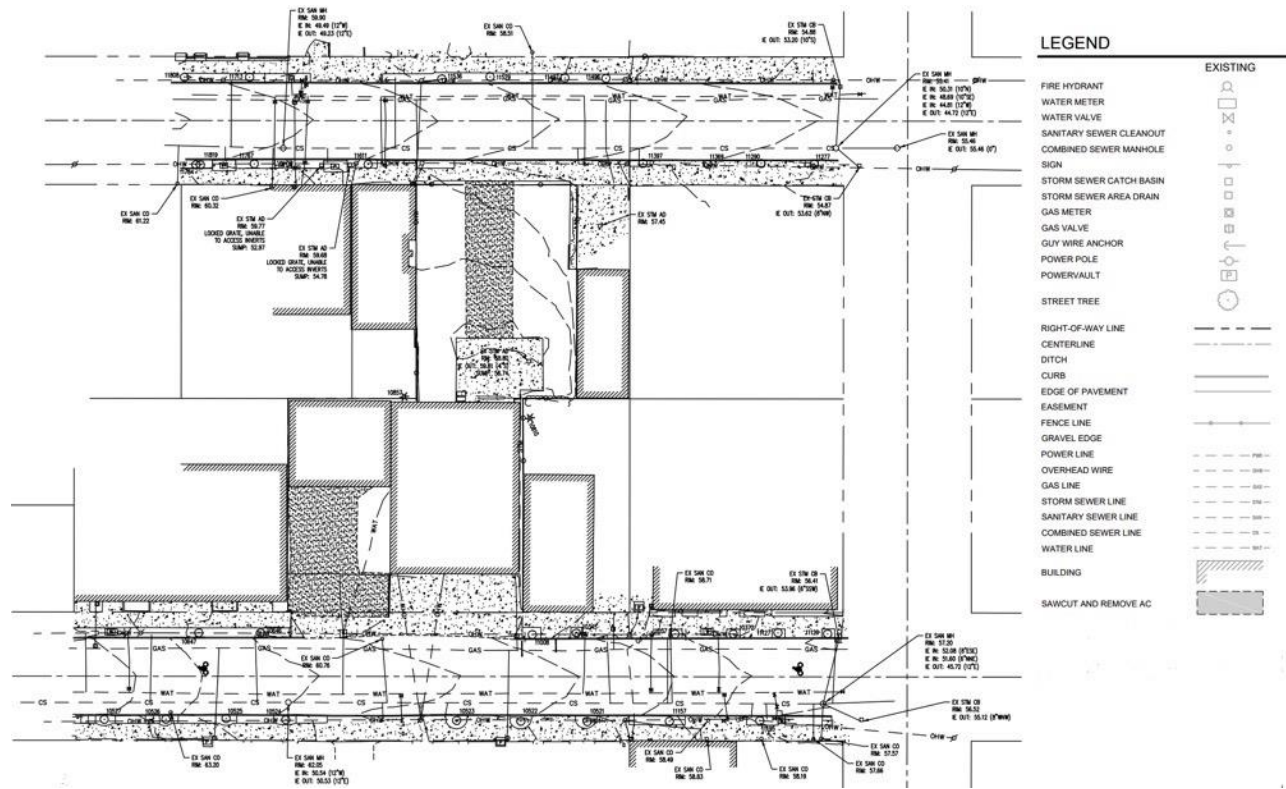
Existing conditions site plan for the Overton Street Veterinary Hospital development.
